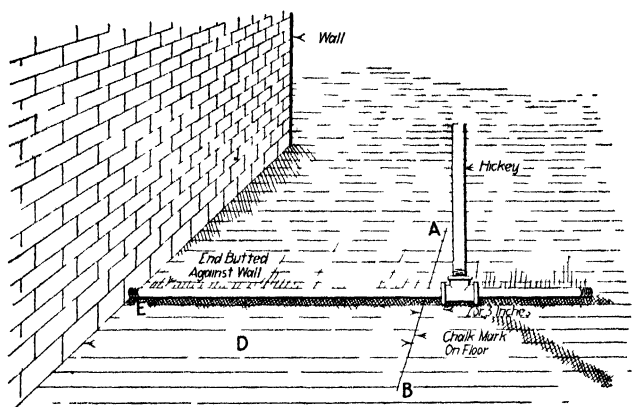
First operation in forming a bend with a hickey. Distance from outside of bend to wall has been laid out on floor.
